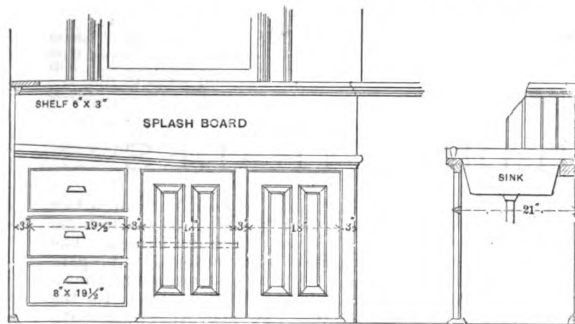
Elevation and Section of Kitchen Sink.—Scale, $\frac{3}{8}$ Inch to the Foot.
